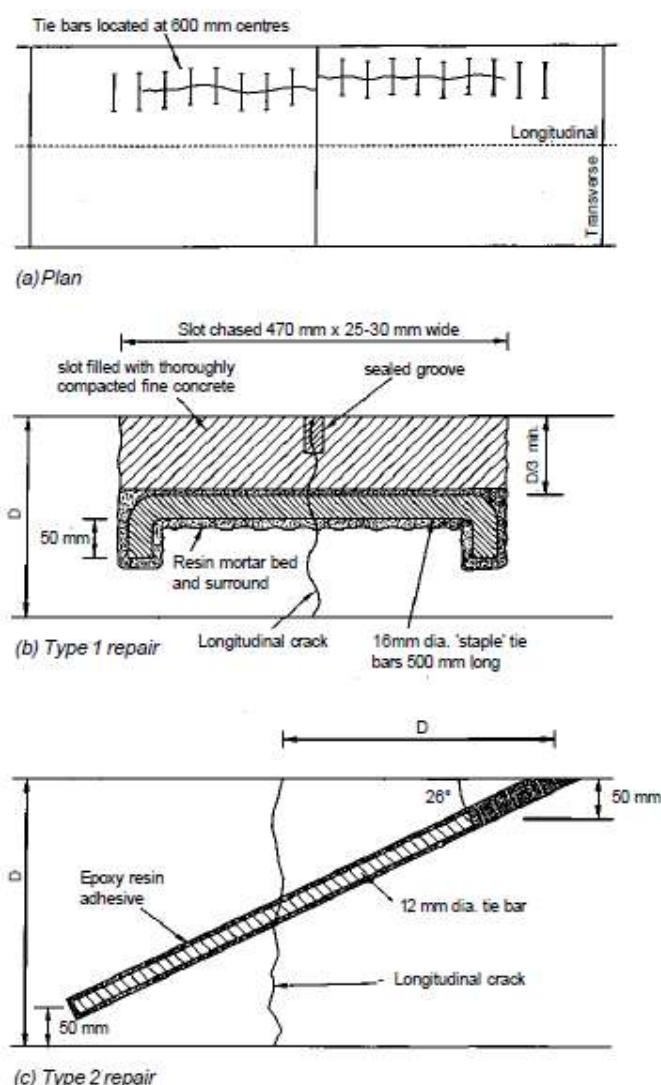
/14- 3 Stitched crack repairs (taken from Figure 8.4 of Concrete Pavement Maintenance Manual, 2001)
